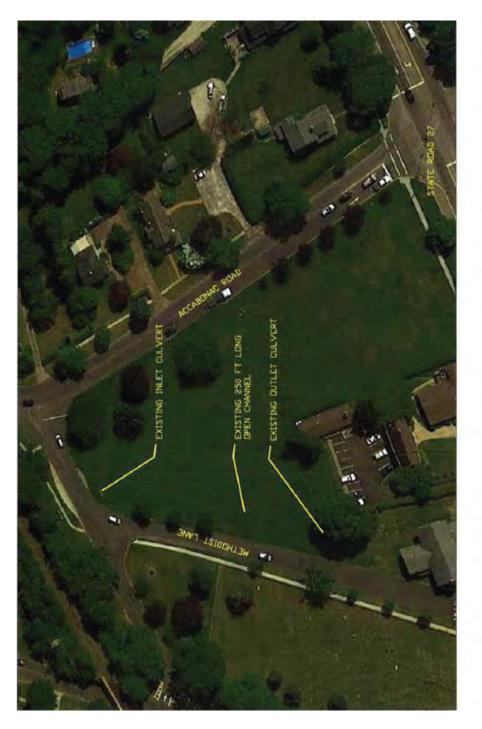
North Hook Mill Green Stormwater Treatment Site
